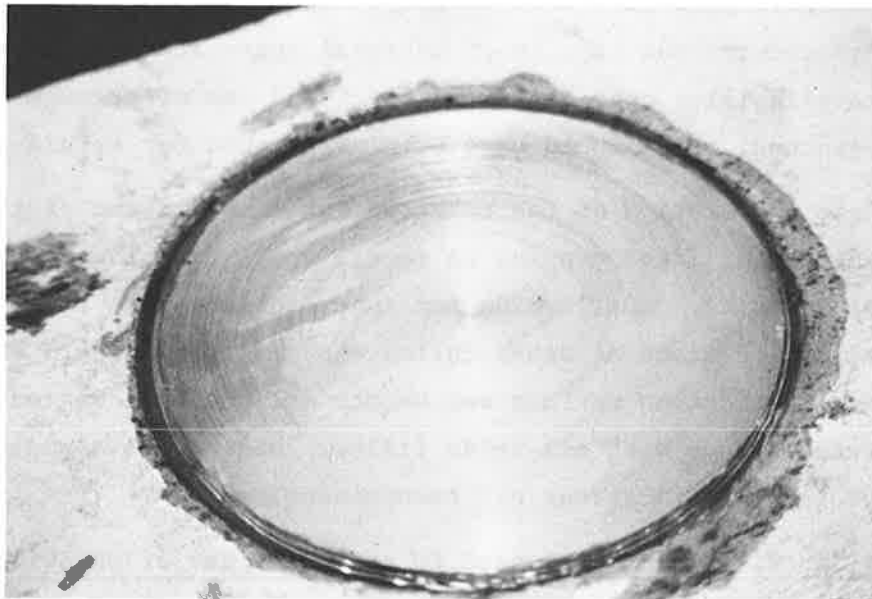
BEARING PLATE INSTALLED FLUSH WITH CROSSTIE BOTTOM SURFACE
